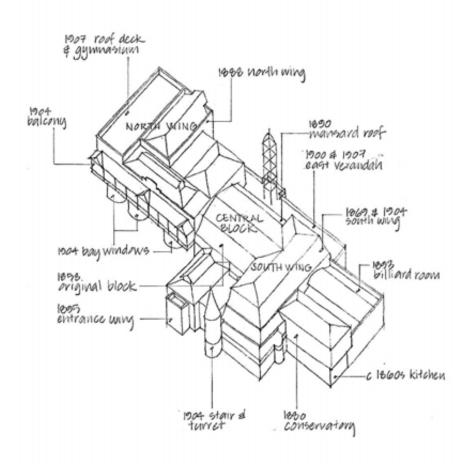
Sketch view of the house, showing principal additions and dates of construction
